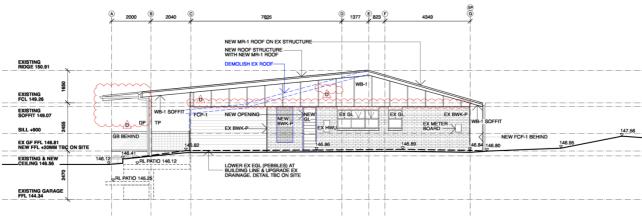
CDC South (Side) Elevation Jones Street, Beacon Hill
